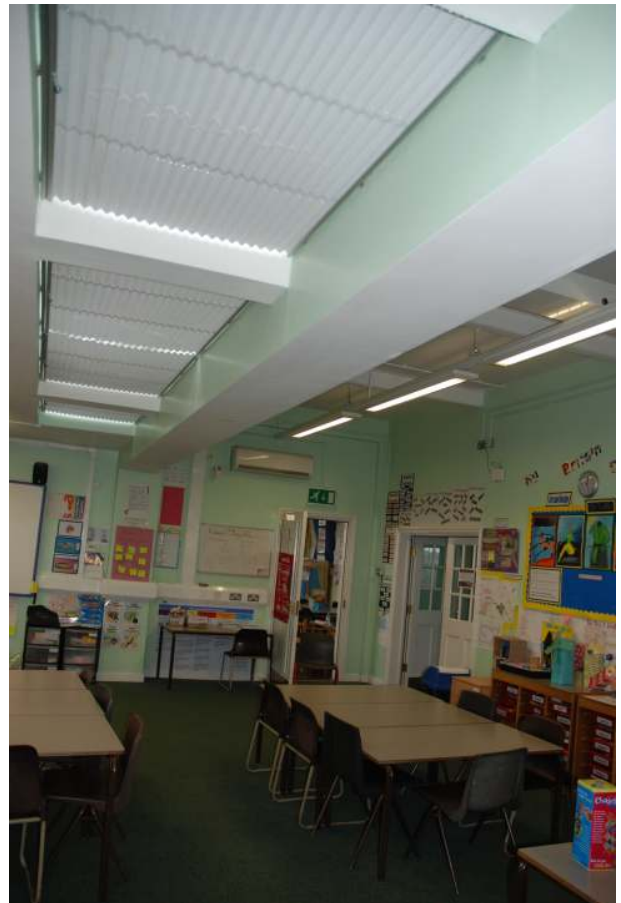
Original doorway and glass panelling in the eastern part of room 3, leading to the stairs
